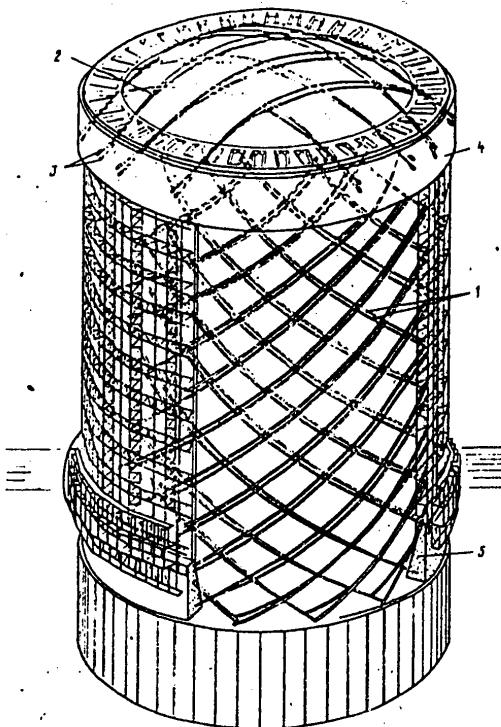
Schematic of the arrangement of the prestressed reinforcing in the protective shell of the pilot power unit. 1 -- helicoidal reinforcing cables installed in the vertical walls of the shell; 2 -- reinforcing cables installed by the orthogonal system in the dome of the shell; 3 -- tension and blind anchors; 4 -- upper cornice; 5 -- lower bracket.
